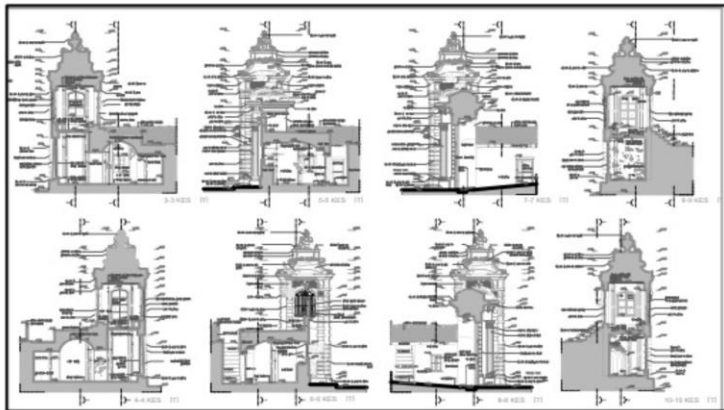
Mecidiye Gate Sections of Tower (Author Archive, Bimtaş, 2009)
